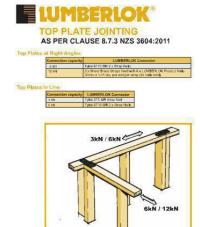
Connecting top plates in line - Walls containing bracing (see 8.7.3.3)
